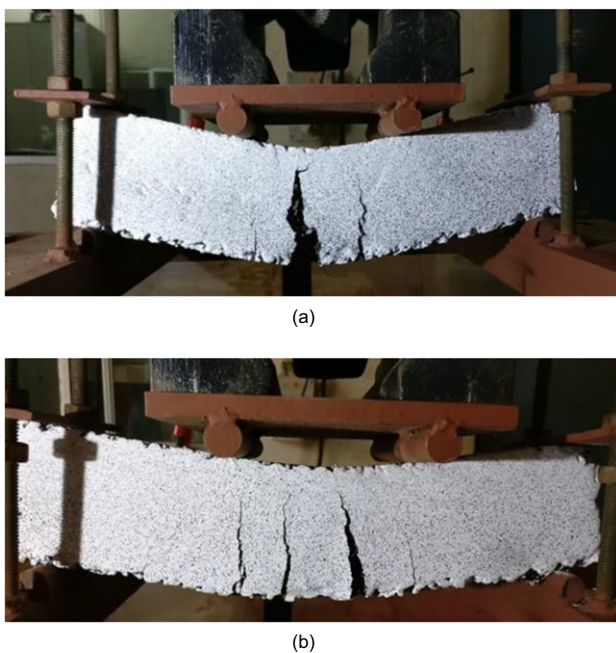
Typical asphalt beam specimens at failure: (a) control specimen (CS); (b) polypropylene geogrid (PP)
